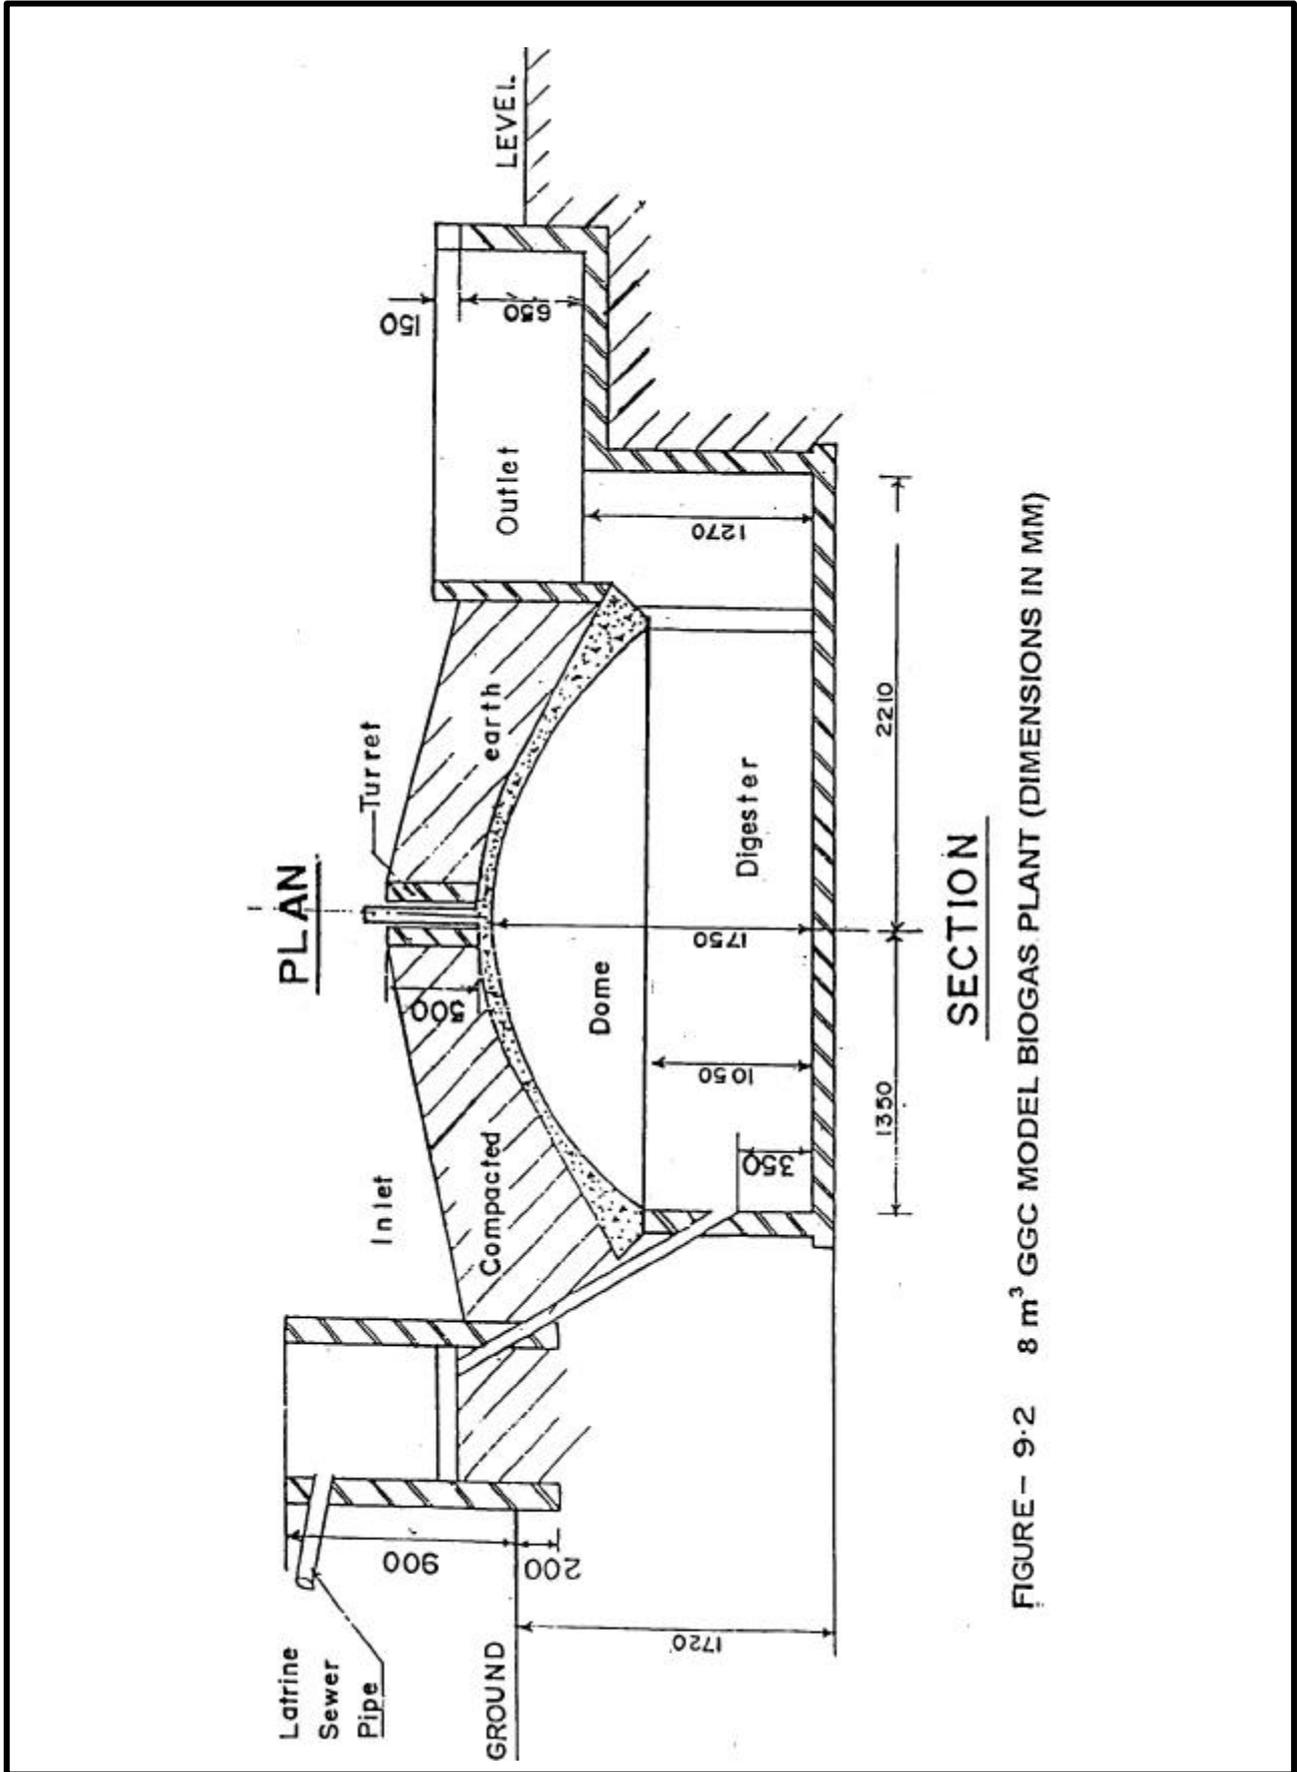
8 m³ GGC MODEL BIOGAS PLANT (DIMENSIONS IN MM)
